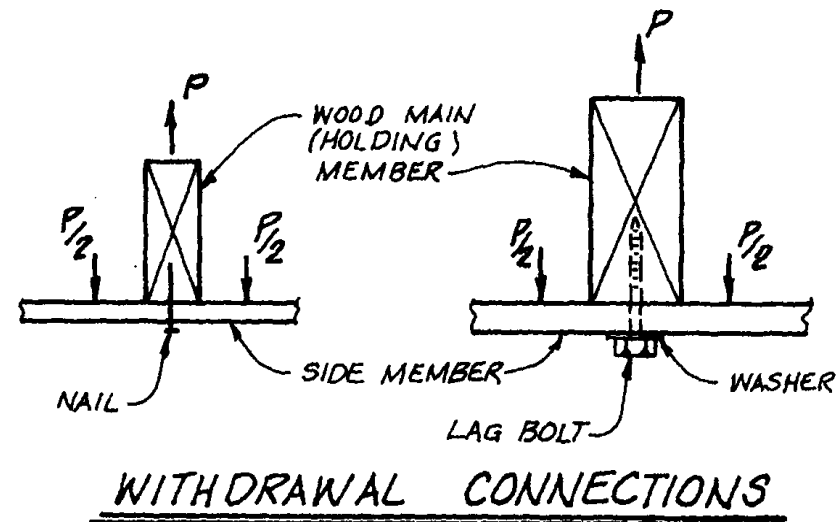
Nail and lag bolt connections subject to withdrawal loading.
